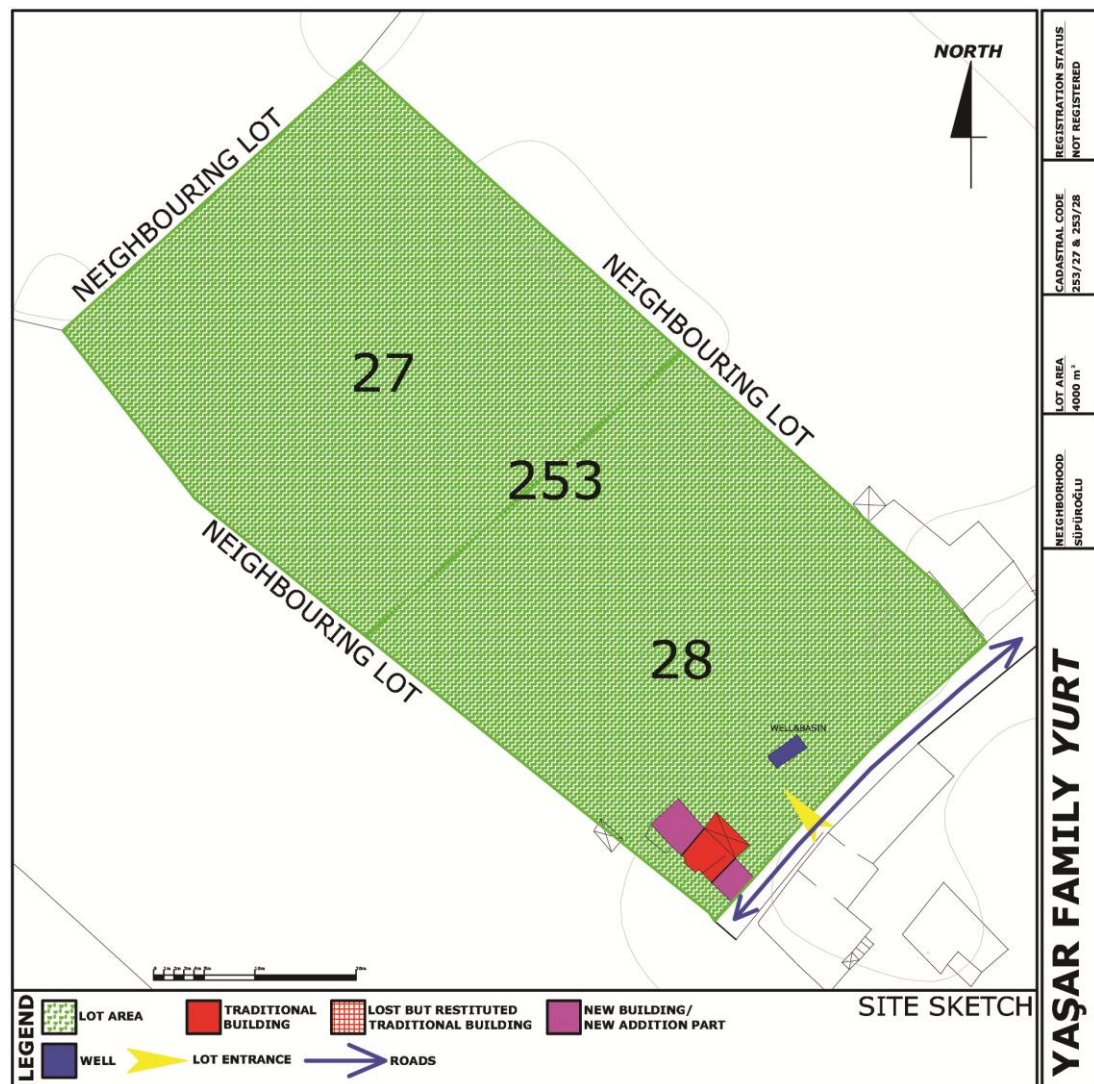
Site plan sketch of the *yurt* of Yaşar Family
